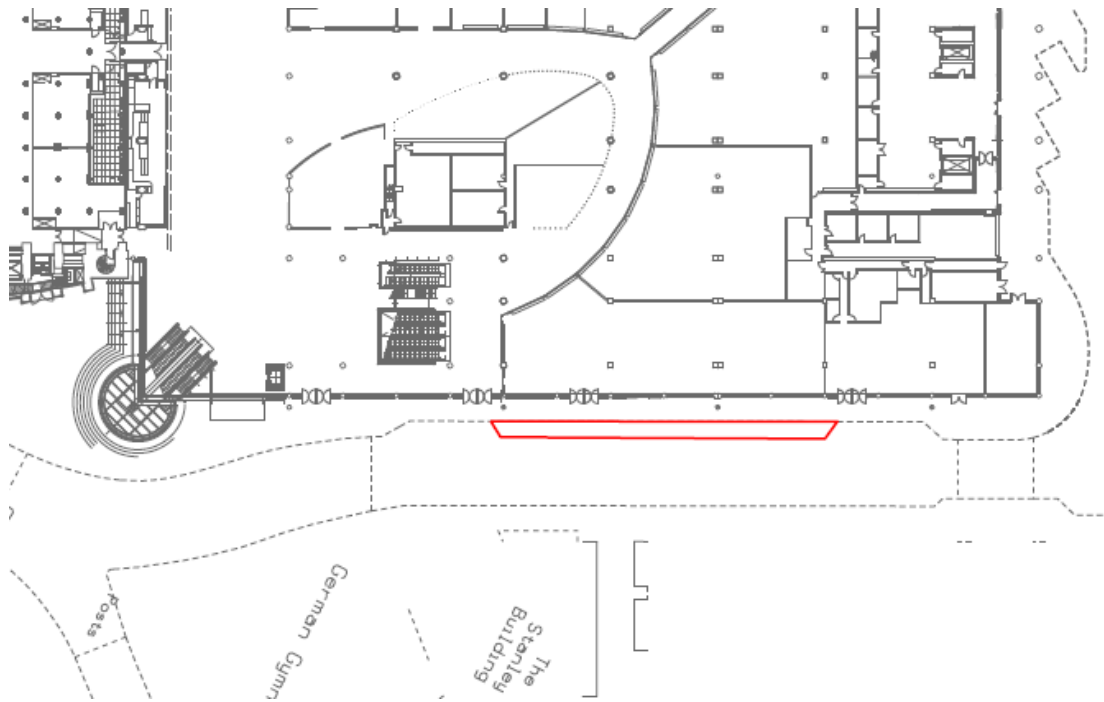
Site Location, outside Unit 23 on Pancras Road.
